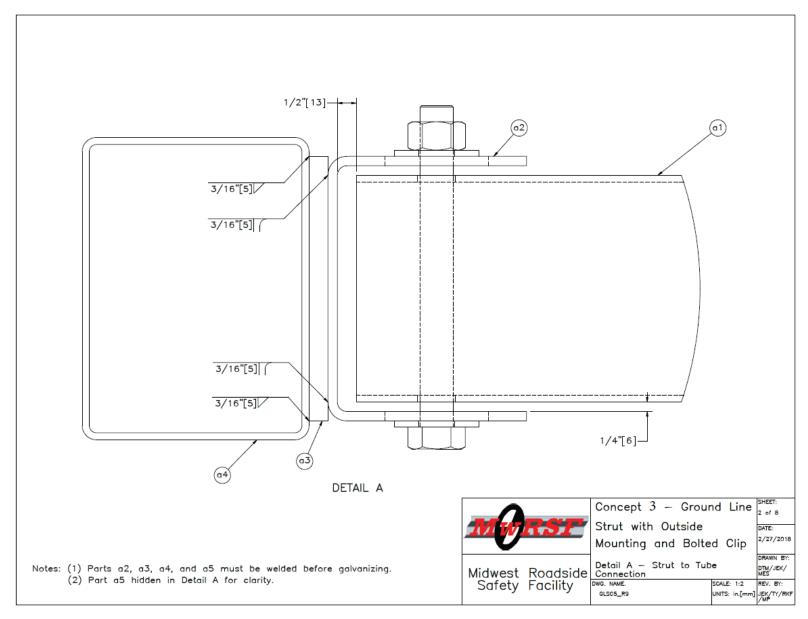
Ground Line Strut Design Concept No. 3 – Strut to Tube Connection
